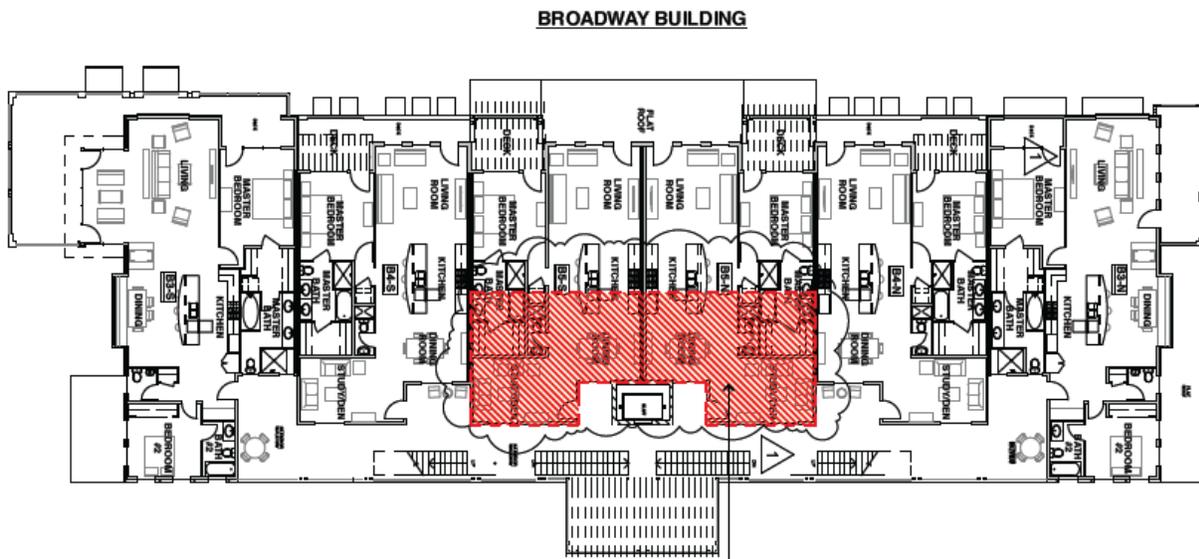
Proposed Broadway Building additions within the approved footprint and massing of the building.
